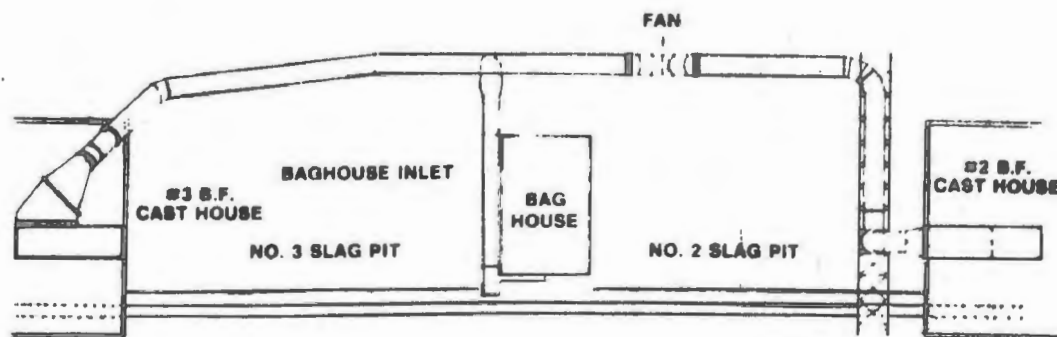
Plan view of No. 2 and No. 3 casthouse fume control system.²
